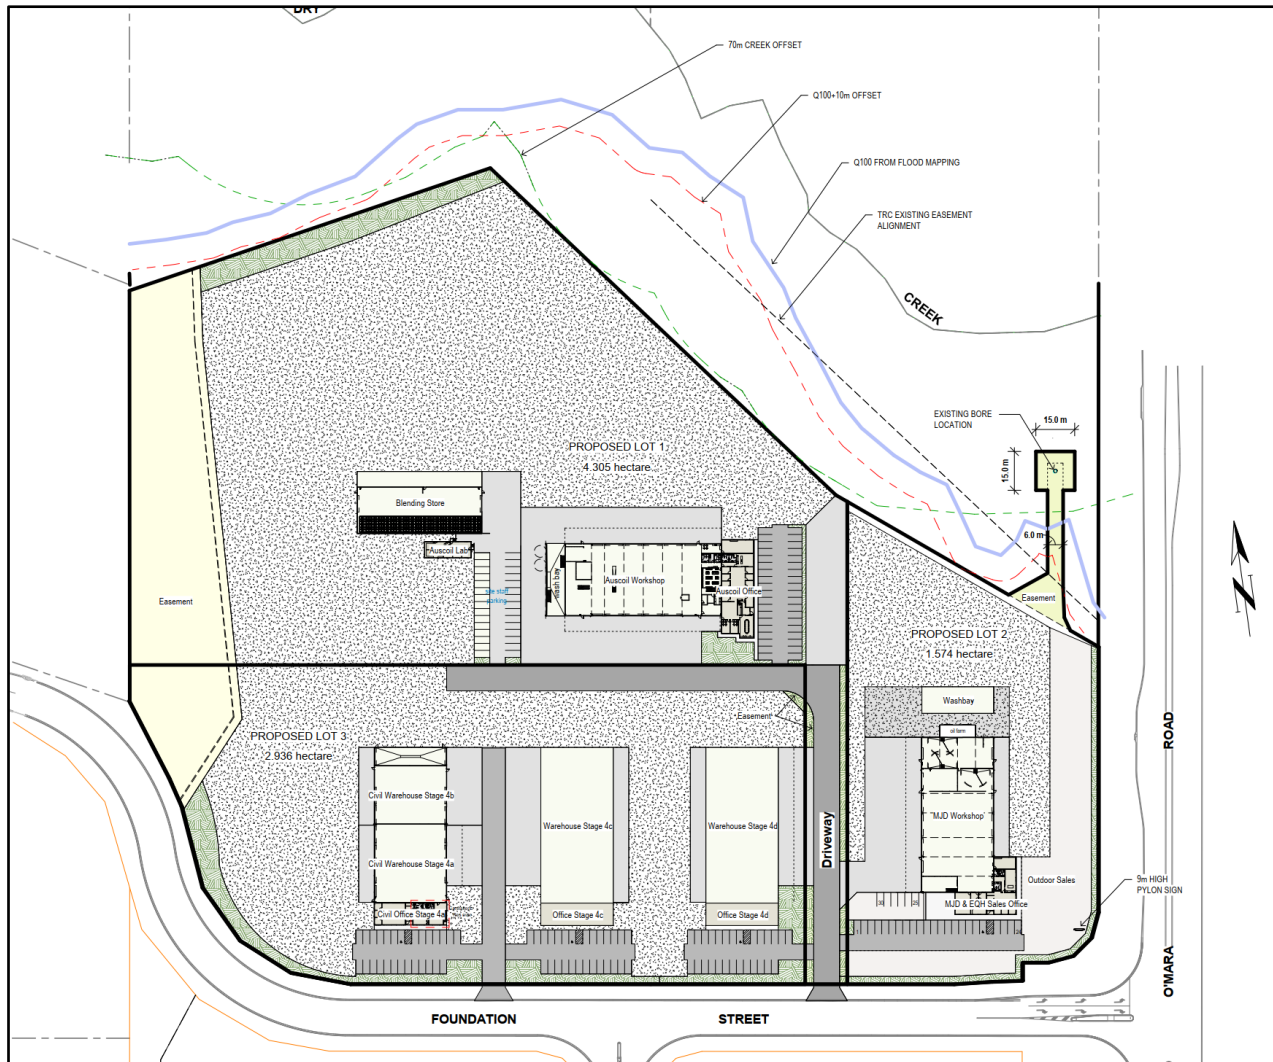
SITE PLAN (FKG DRAWING: 2570.001)
